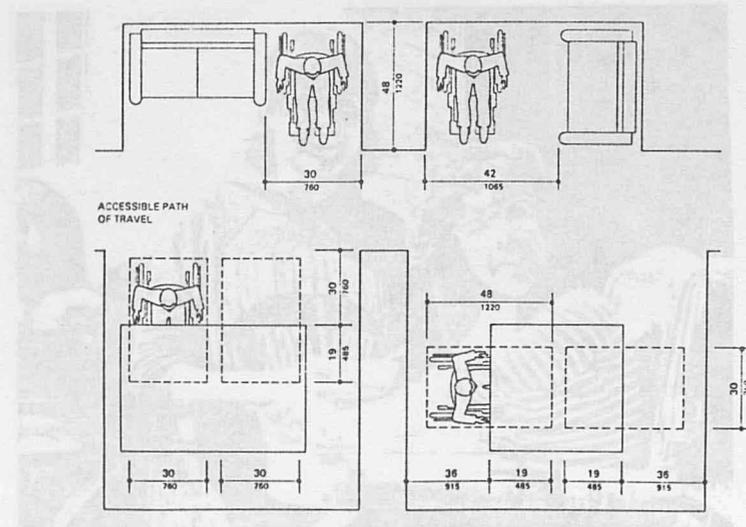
Tables. ANSI, American National Standard for Buildings and Facilities, 1986.
